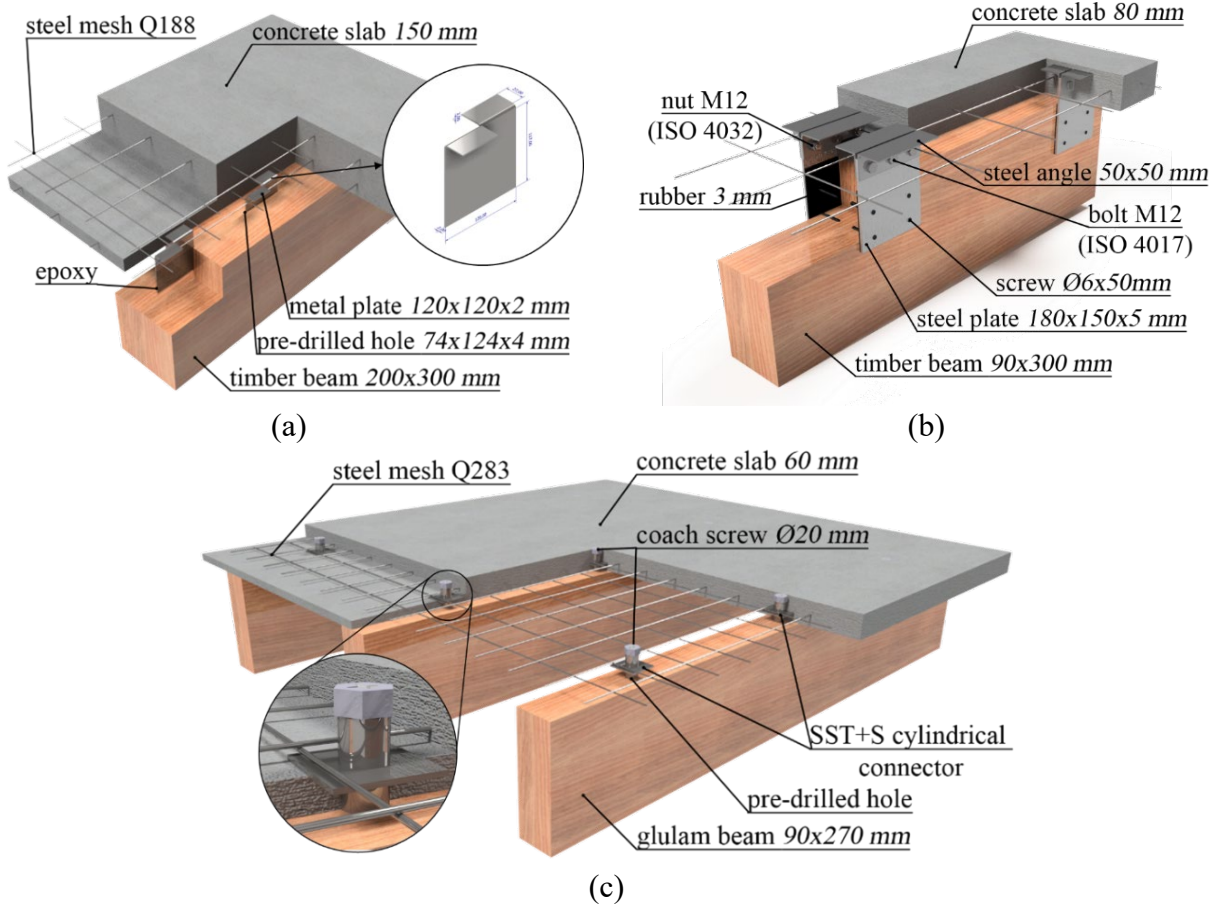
Example steel profiles as shear connections: (a) folded steel plate embedded in concrete and glued in timber; (b) steel plate embedded in concrete and screwed to timber beam with vulcanized rubber layer; (c) steel tube with coach screw. Connections were rebuilt based on [86,87].
